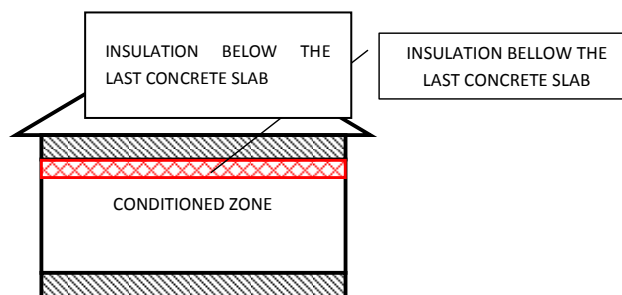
Insulation layer below the last concrete slab (Source: Boneta et al., 2013)
